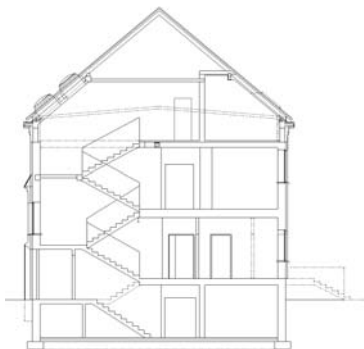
A sectional view of the old building in Bydgoska Street. Visible are the existing flat roof and the new gable roof. Drawing: B. DEJA
